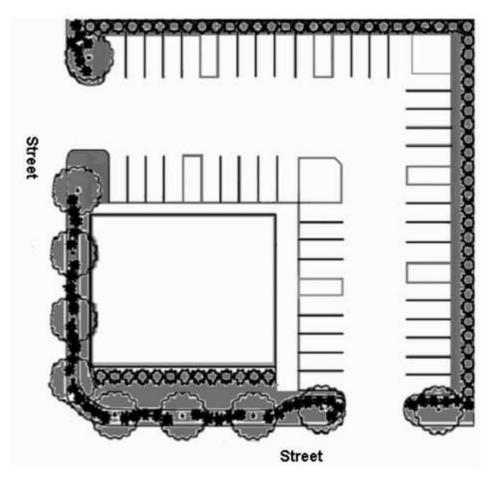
Perimeter Landscaping Shaded areas denote areas of perimeter landscaping. Not to Scale.
